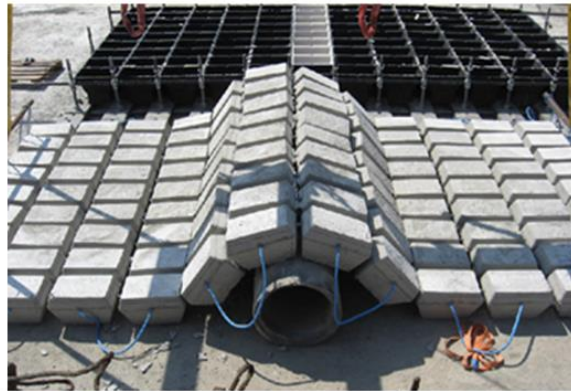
Armorflex (Concrete Block Mattresses) by Technicrete
